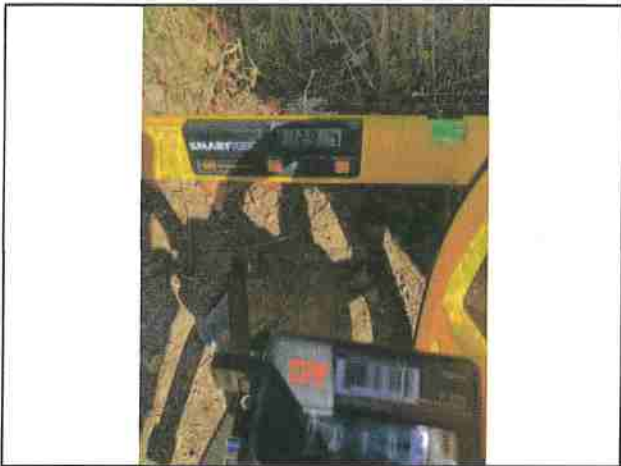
Mad River Medicinals Private Access Rd Slope 12.9% Width 10.4'
